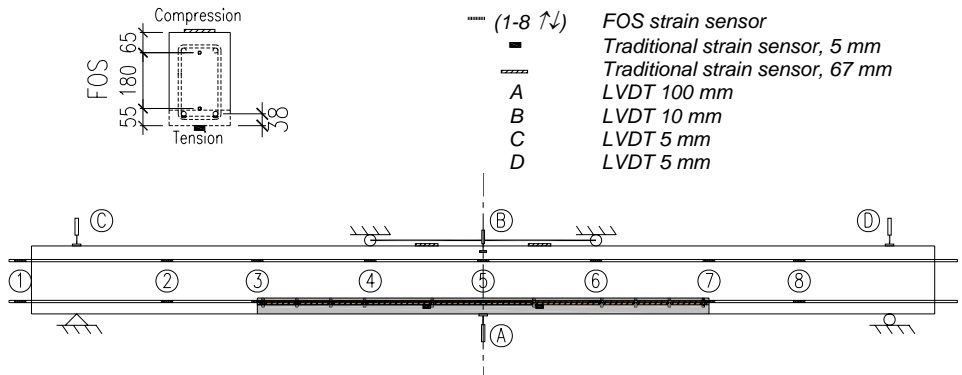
Monitoring setup for beams where the cover concrete was removed, repaired and strengthened.
